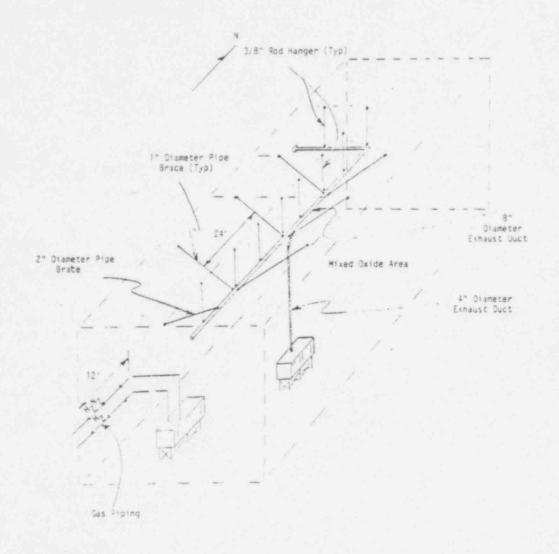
SCHEMATIC OF MIXED OXIDE EXHAUST BRACING AND SUPPORTS
